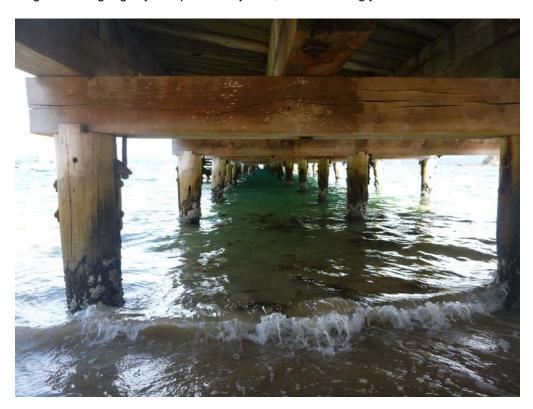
View looking seaward under the jetty showing pairs of piles, headstocks, girders and decking
